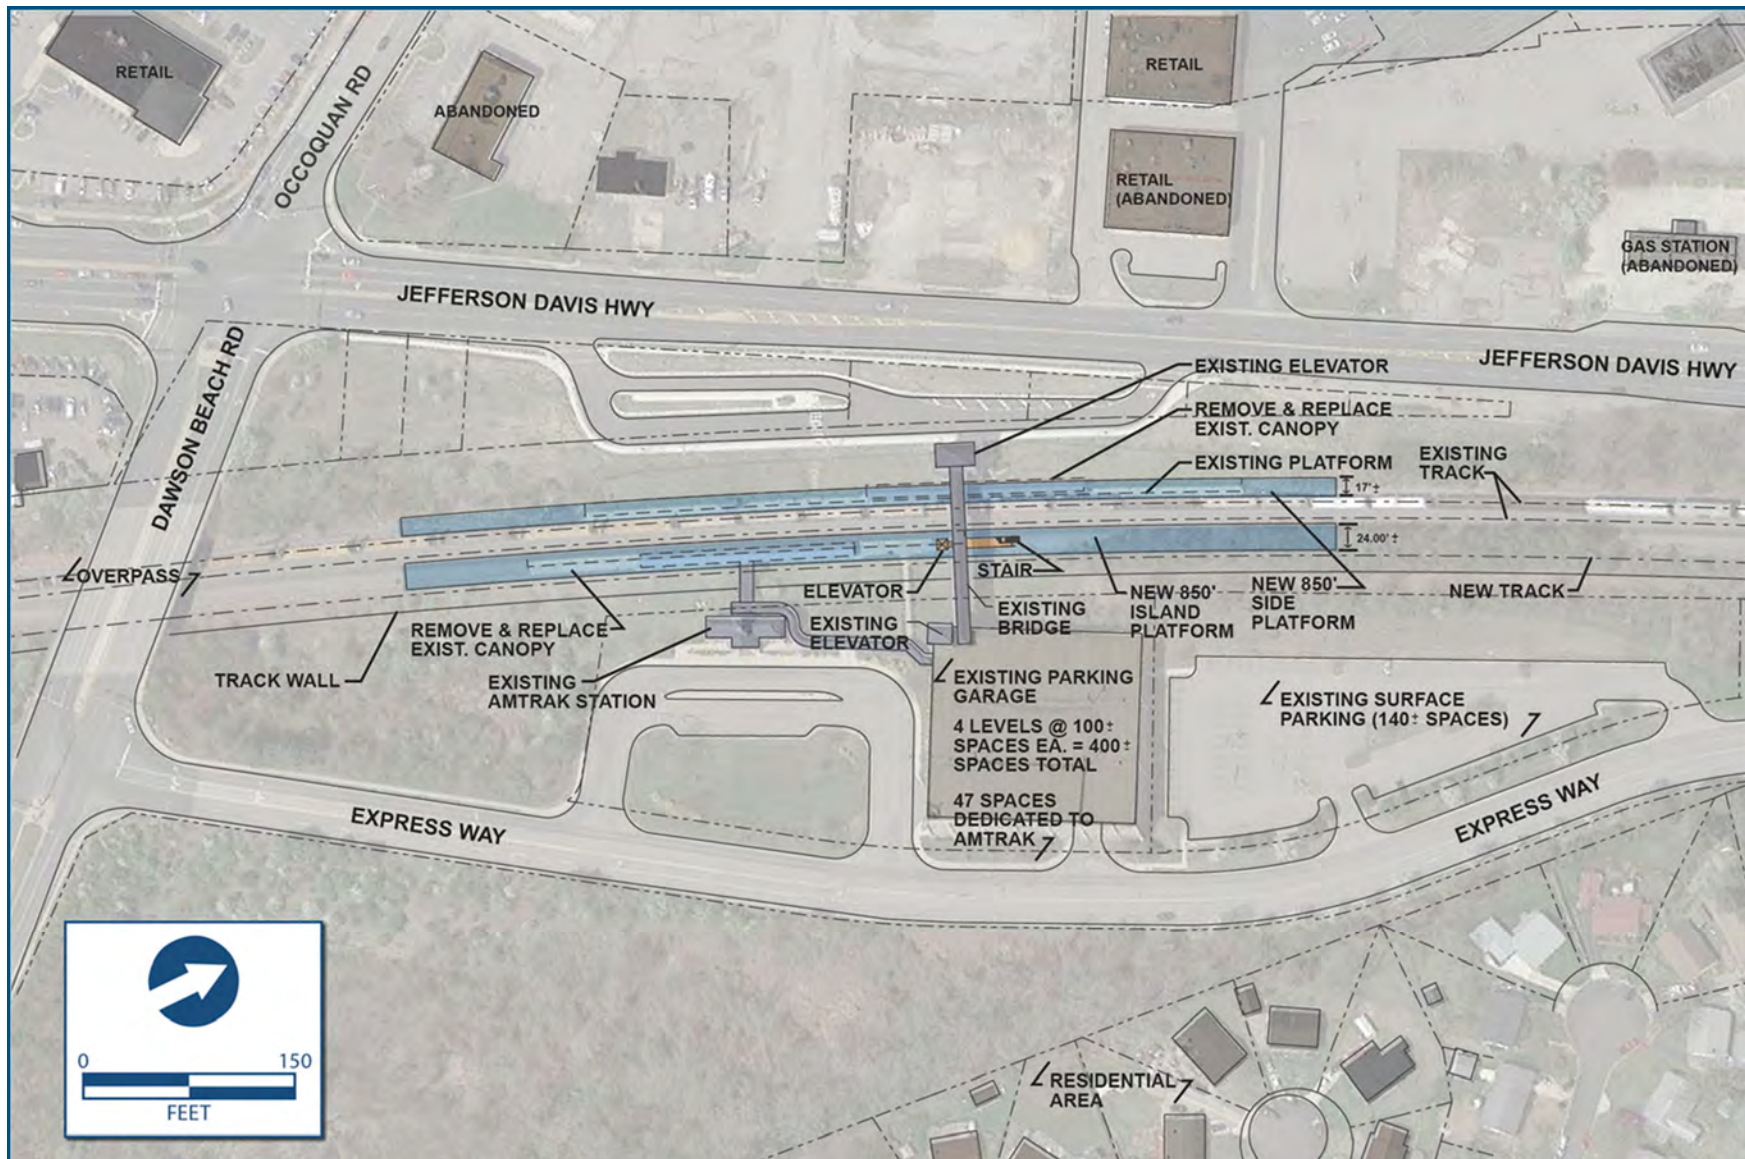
Woodbridge Station Improvements for Build Alternative 2A
